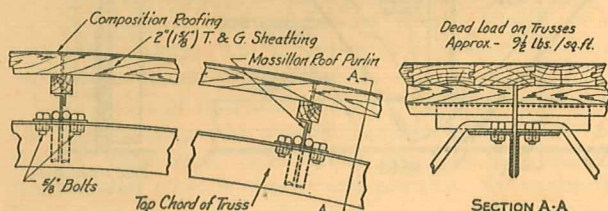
2" (15/8") T & G Decking on Roof Purlins
